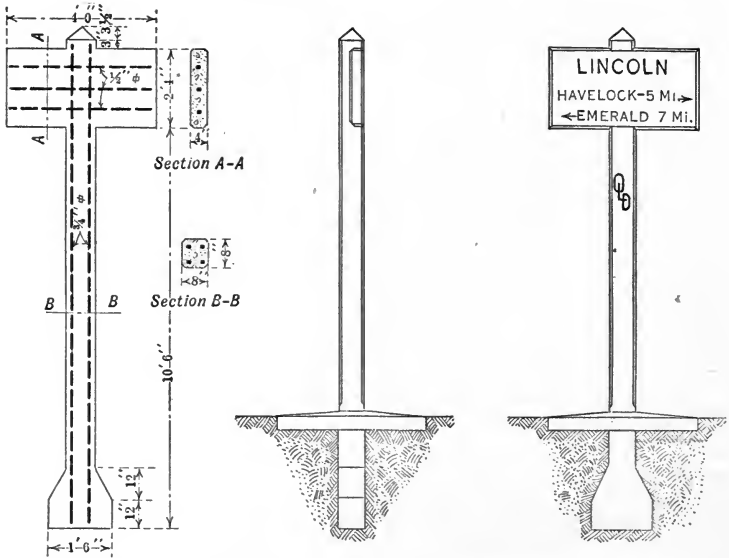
Standard Concrete Road Markers, Lancaster Co., Nebraska.
